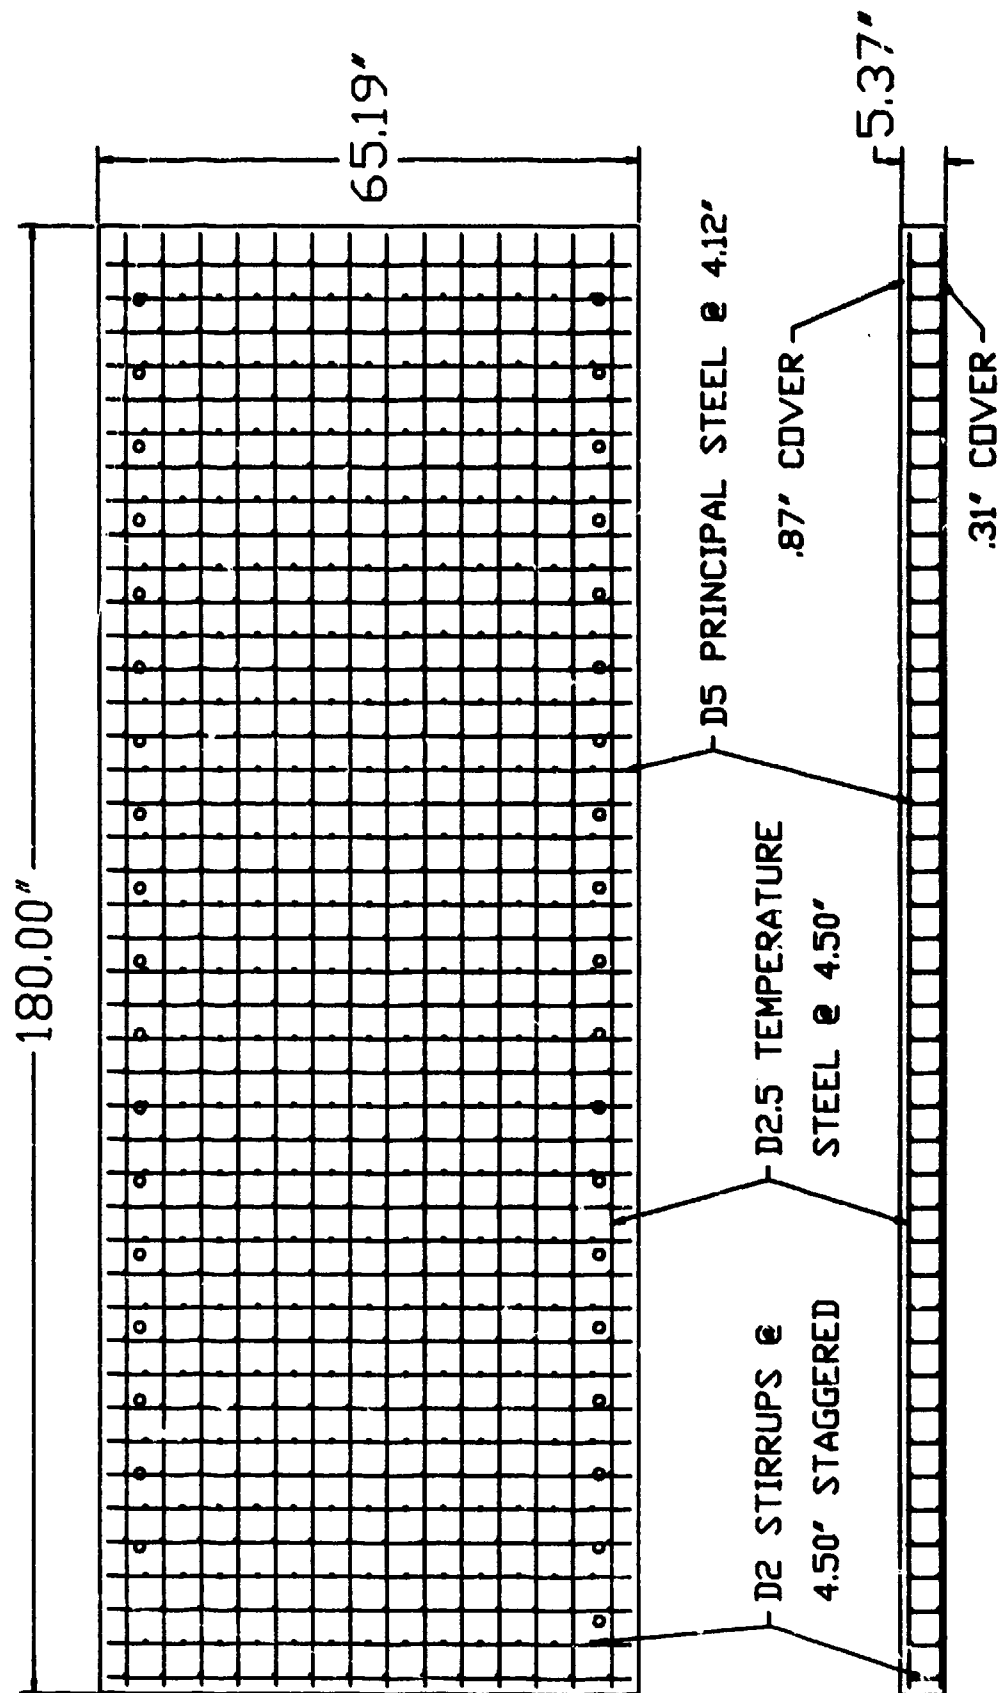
Reinforcement layout for wall panels 8 and 9.
